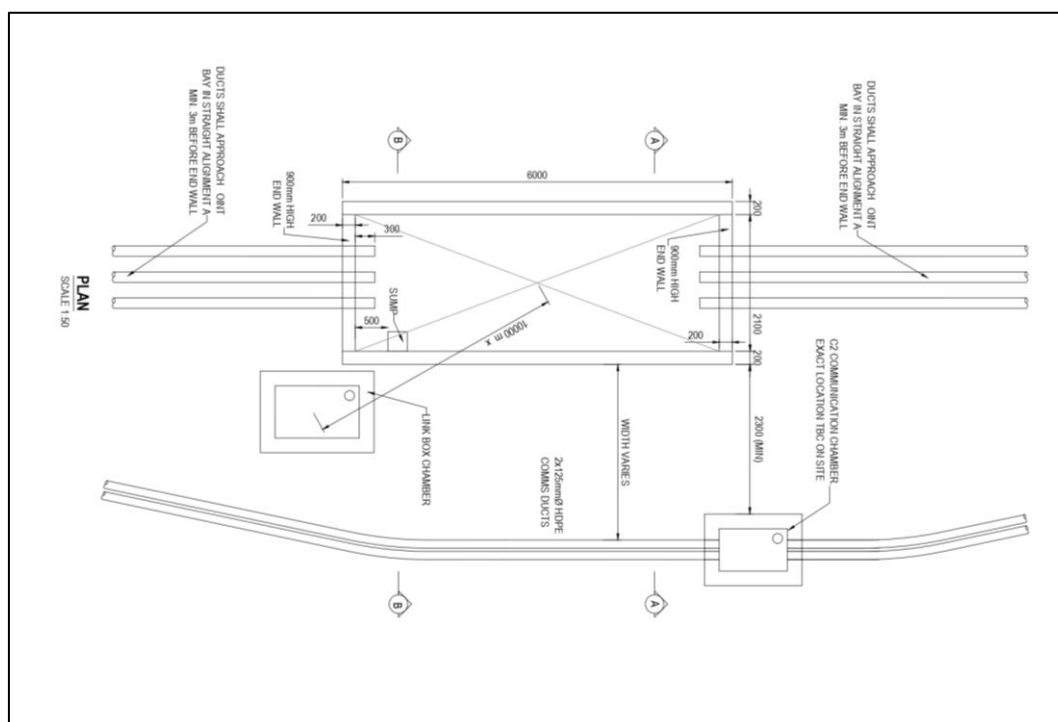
Typical Joint Bay Layout (CSEA Sheet: Drawing 1531)
